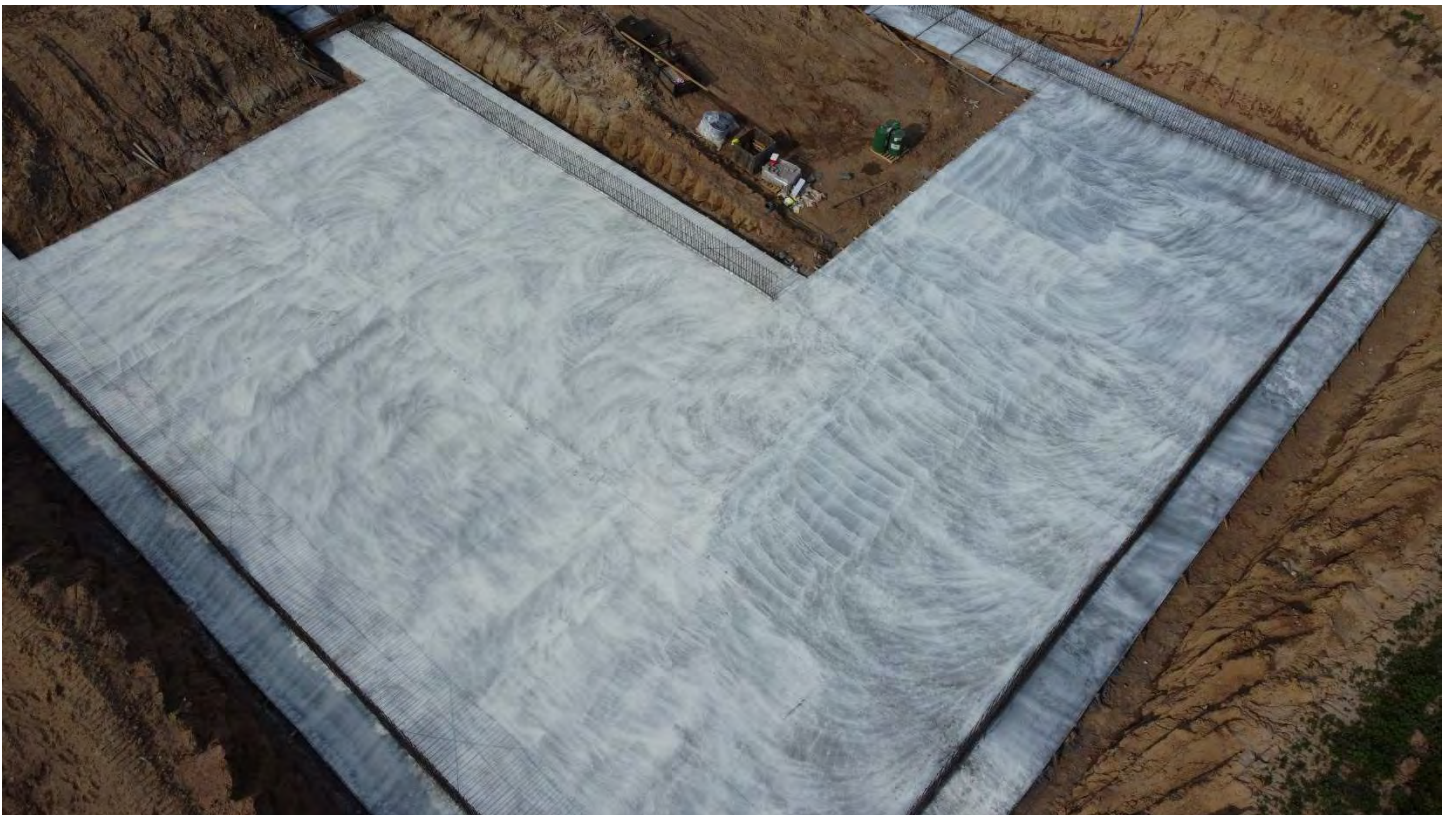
Floor concrete pour 24 hours post pour, crack and visual inspection, Krcmarik 6/11/24
